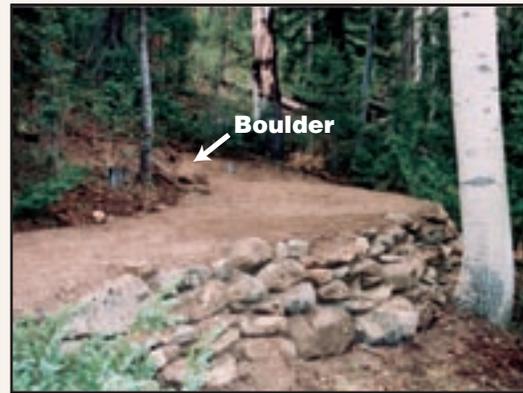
This newly reconstructed switchback includes a landing reinforced with a retaining wall. A boulder placed at the inside of the turn prevents shortcutting.
